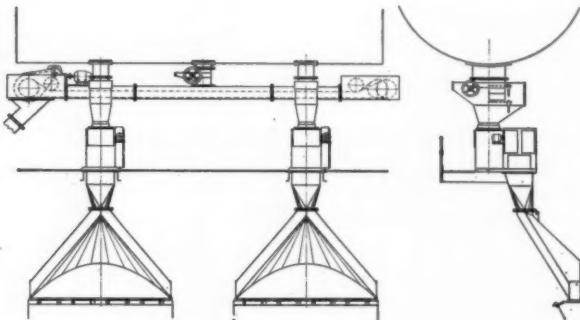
Typical bunker-to-stoker arrangement with triple valve and under-bunker conveyor
